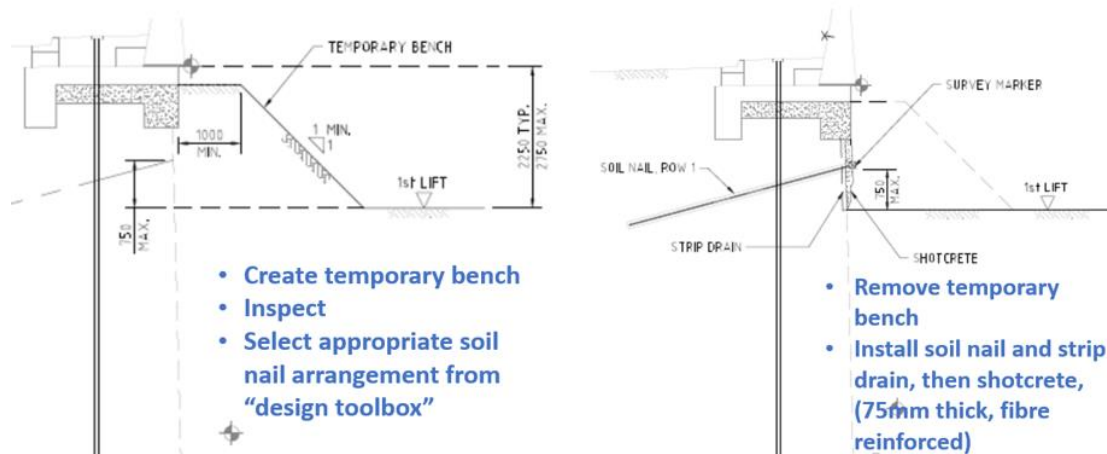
Implementing the observational method during construction of a soil nail/shotcrete wall.
